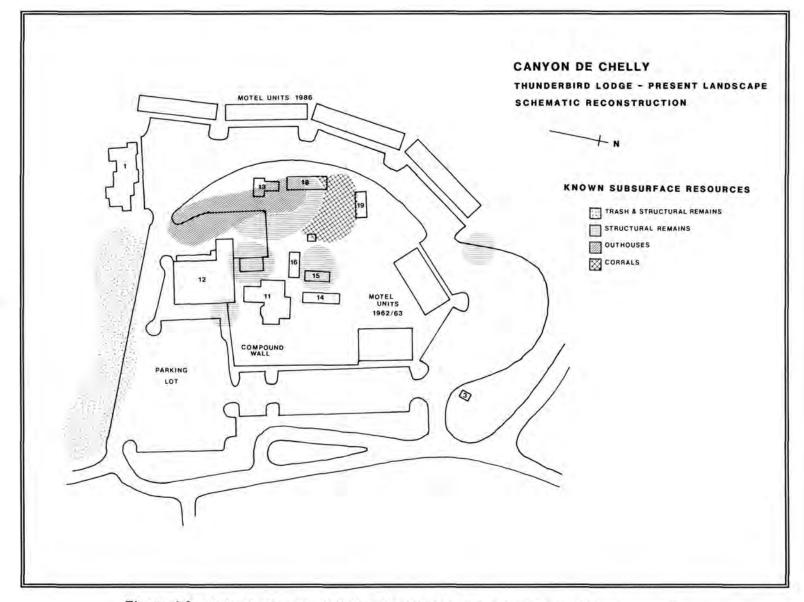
Modern building plan of the Thunderbird Lodge showing known areas of historic structures.
